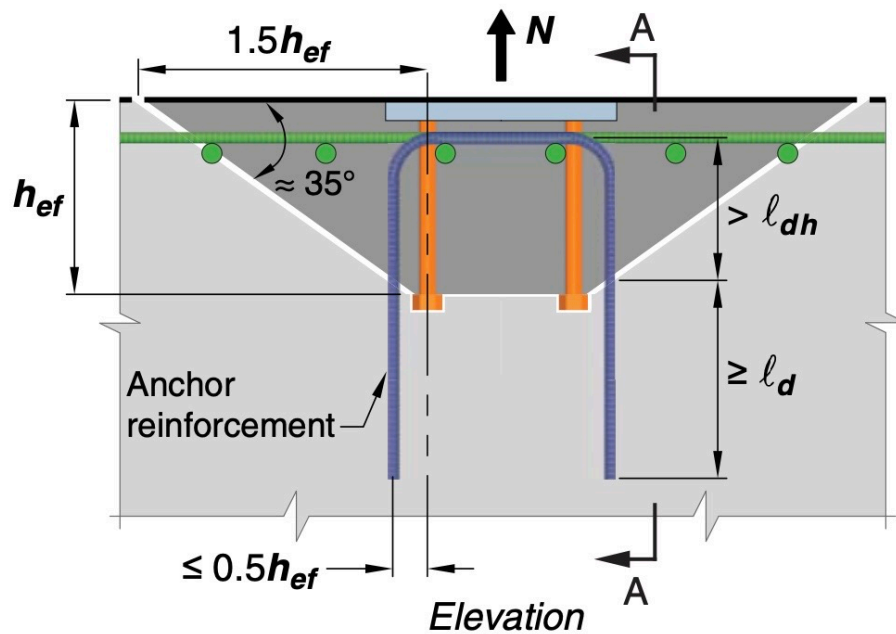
Anchor reinforcement for tension.
